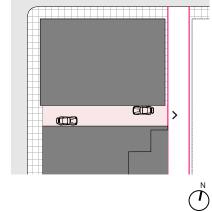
Private Void 4; 1:1,200 Existing, plan
